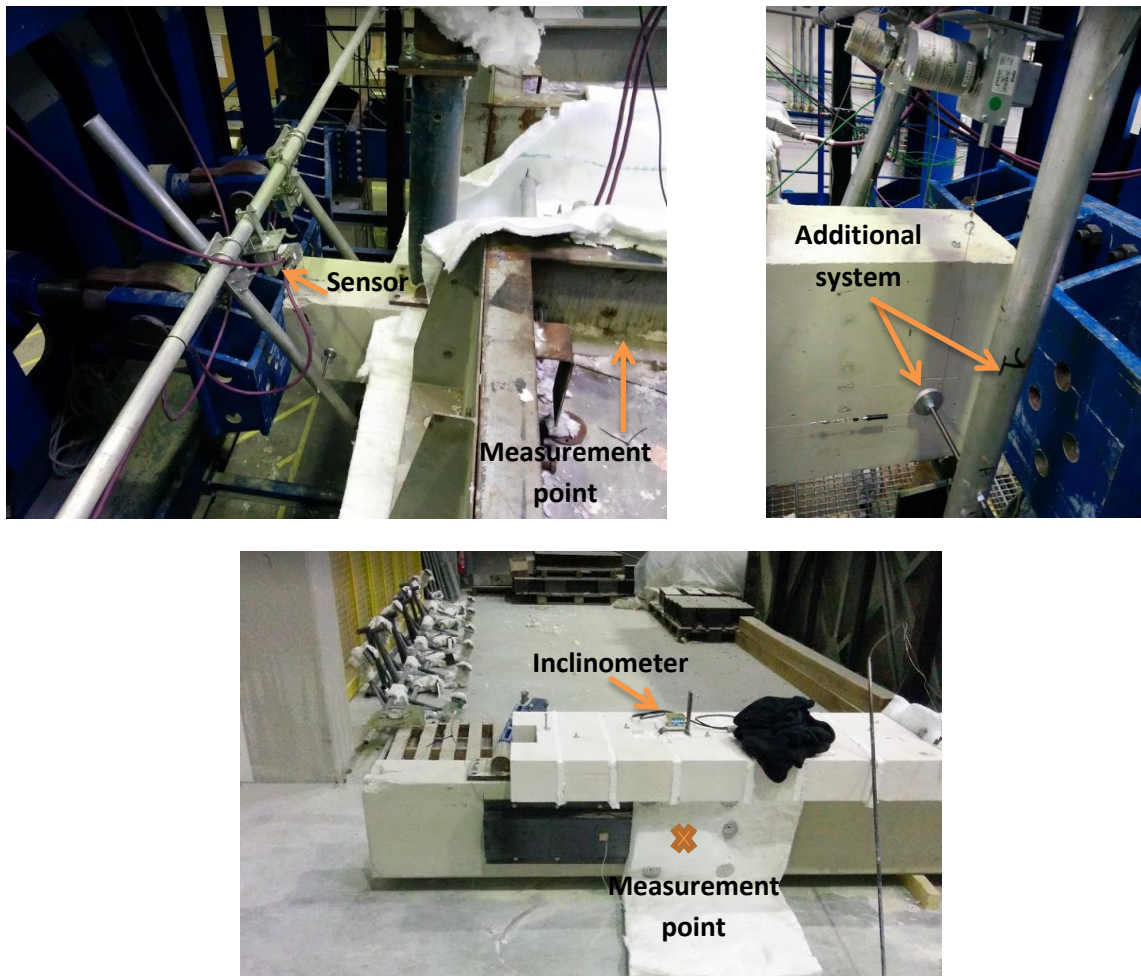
The measurement of the horizontal displacement and rotation during the Test 2
